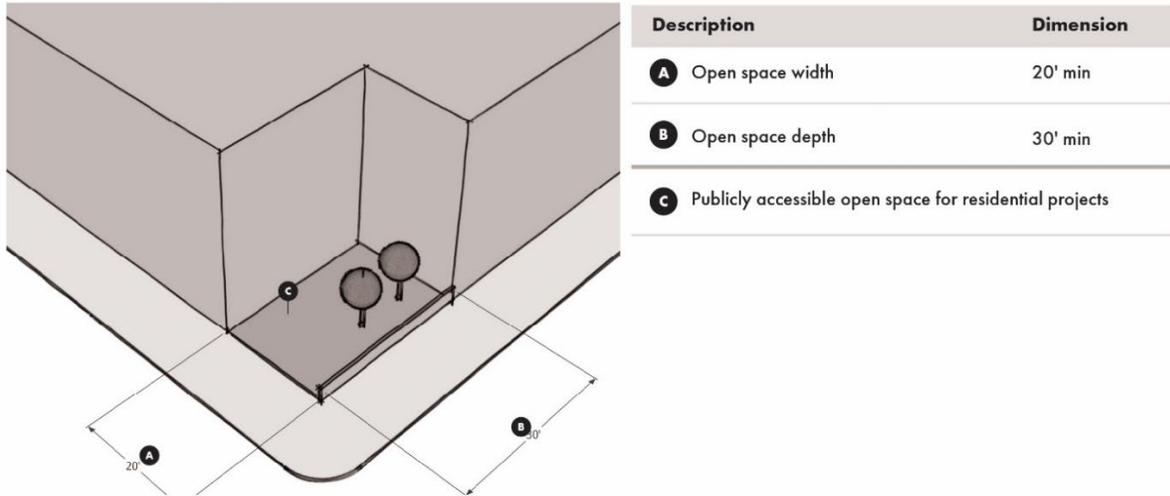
II: Open space for an outdoor dining area.
